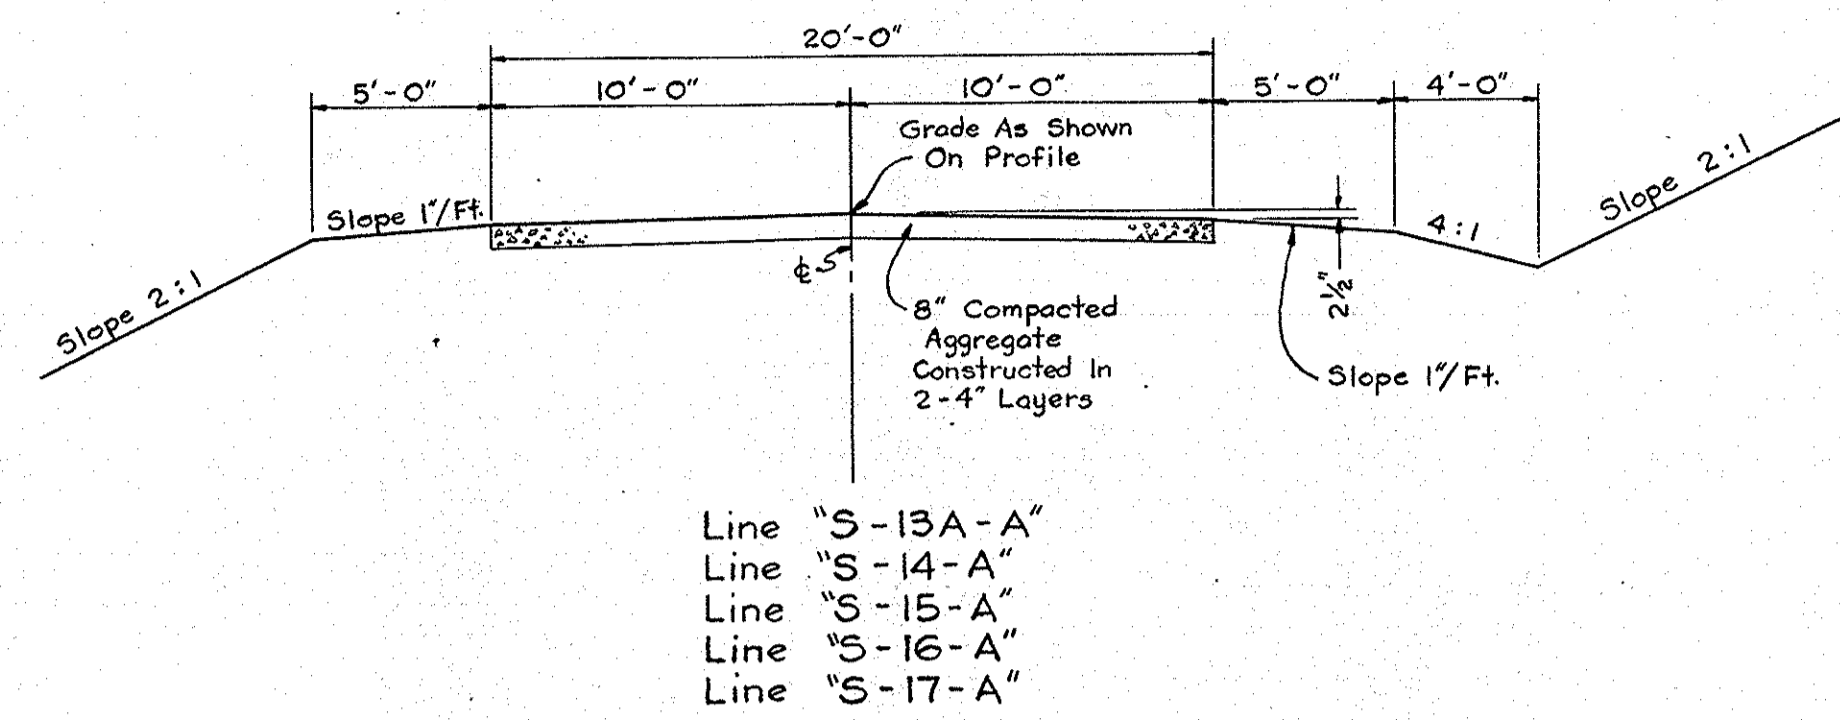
DETAIL OF INTERSECTION & PUBLIC ROAD APPROACH ON LEFT & RIGHT
